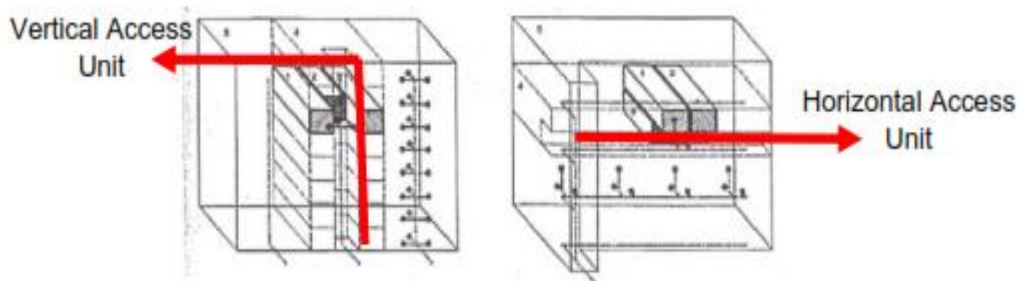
Vertical and horizontal access in the building (Shneider,F. , 2003).
